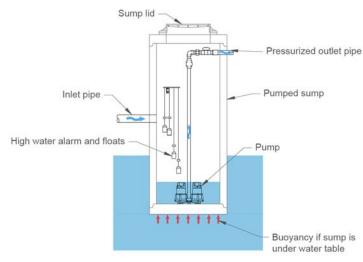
Typical section of pumped sump where bottom of sump is submerged.
